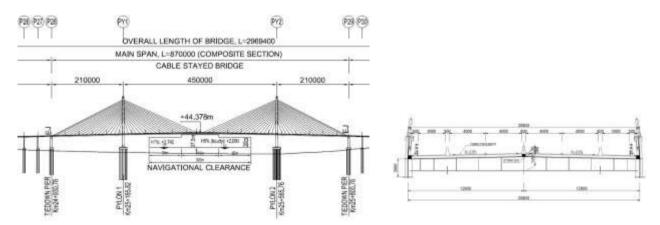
Side view and typical cross-section of bridge deck – Vam Cong Bridge
